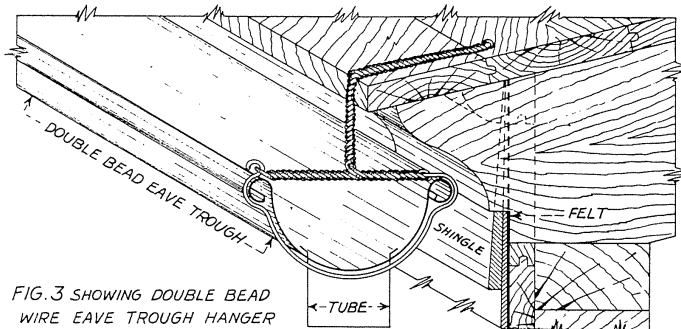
SHOWING DOUBLE BEAD WIRE EAVE TROUGH HANGER
